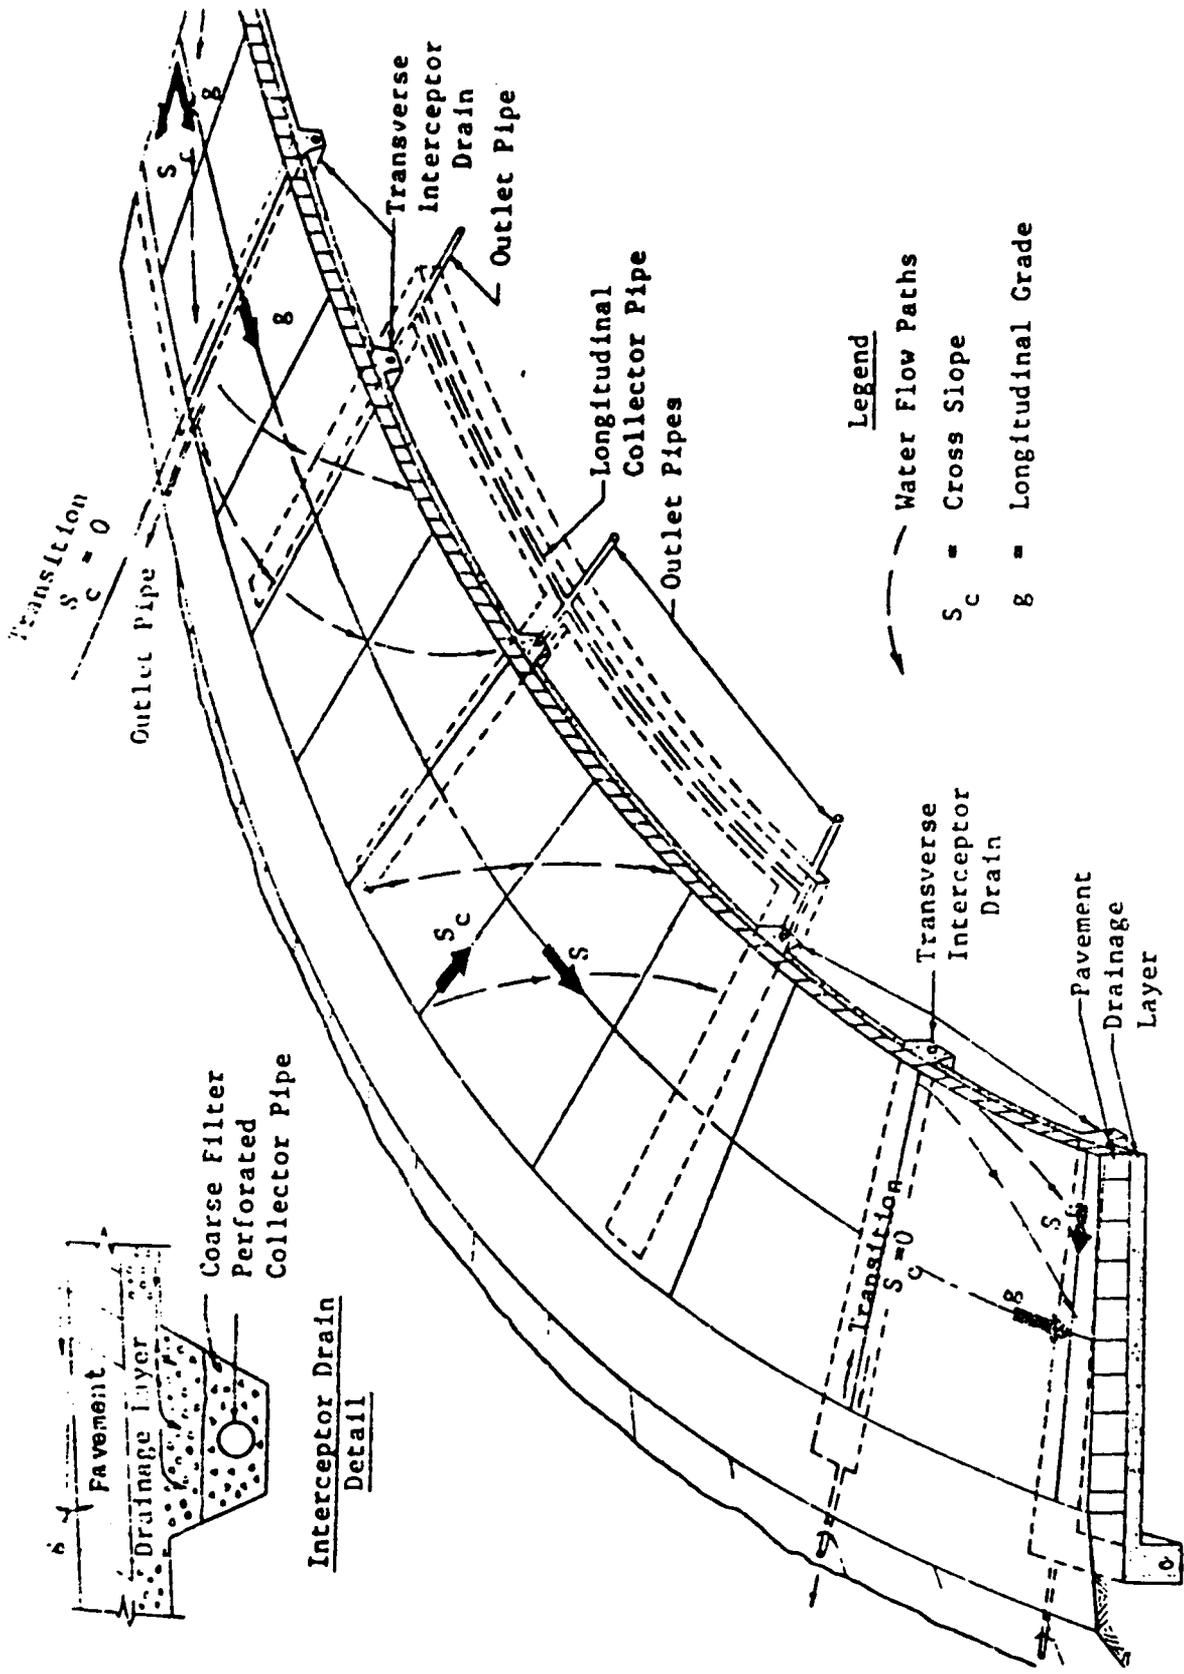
Placement of Longitudinal and Transverse Subdrains in a Pavement System (Ref. 11).
